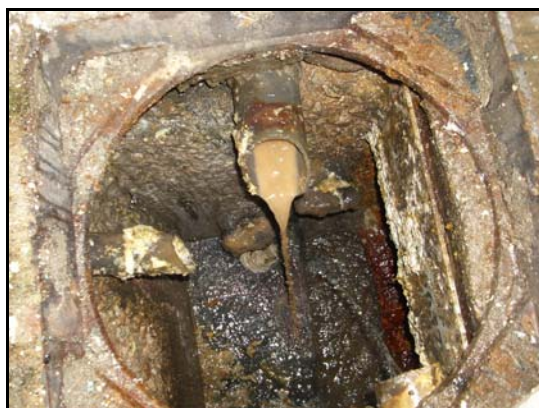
Example of ECs in storm drain manhole in Tsuen Wan
